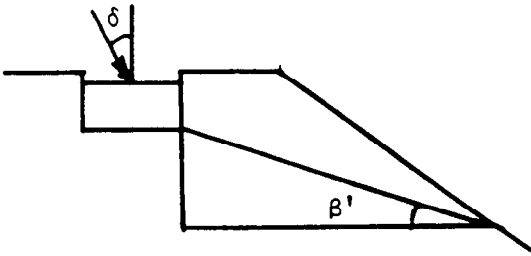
Shallow footing near a slope with a load inclined towards the slope.
